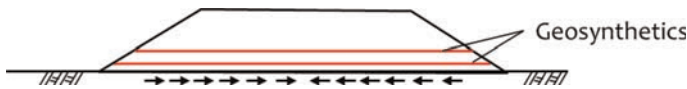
Geosynthetic reinforcement applied to an embankment over a soft soil foundation.
